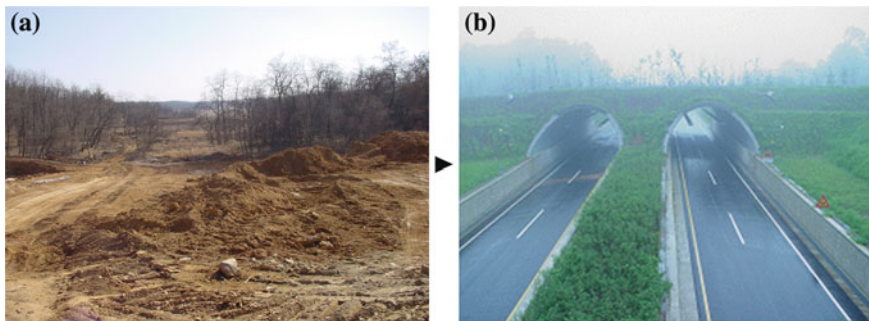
The view of the constructed ecological bridge at the DMZ in Paju. a The damaged habitats in road construction. b The restoration habitat after the construction of the ecological bridge
